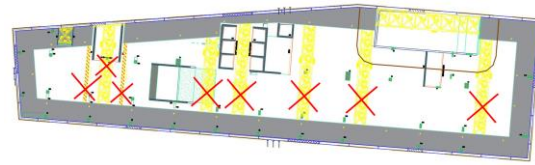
Floor plant -1, with the identification of the eliminated metal shoring considered.
